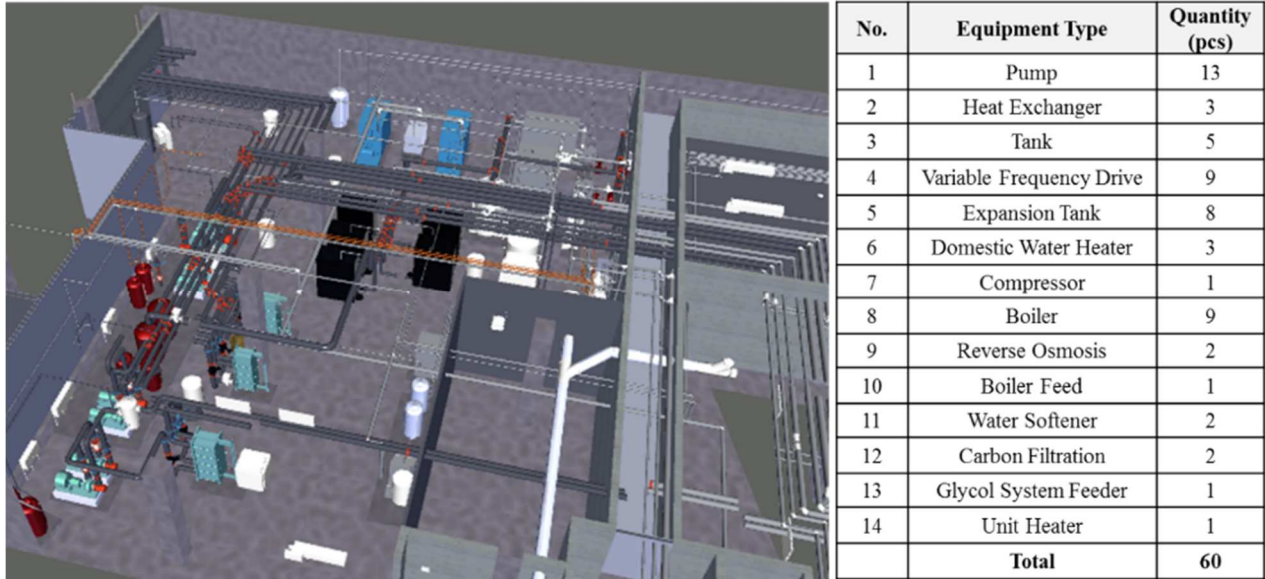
Model view of the boiler room and the mechanical equipment located in the room (Courtesy of Leducor Design-Build Inc.)
